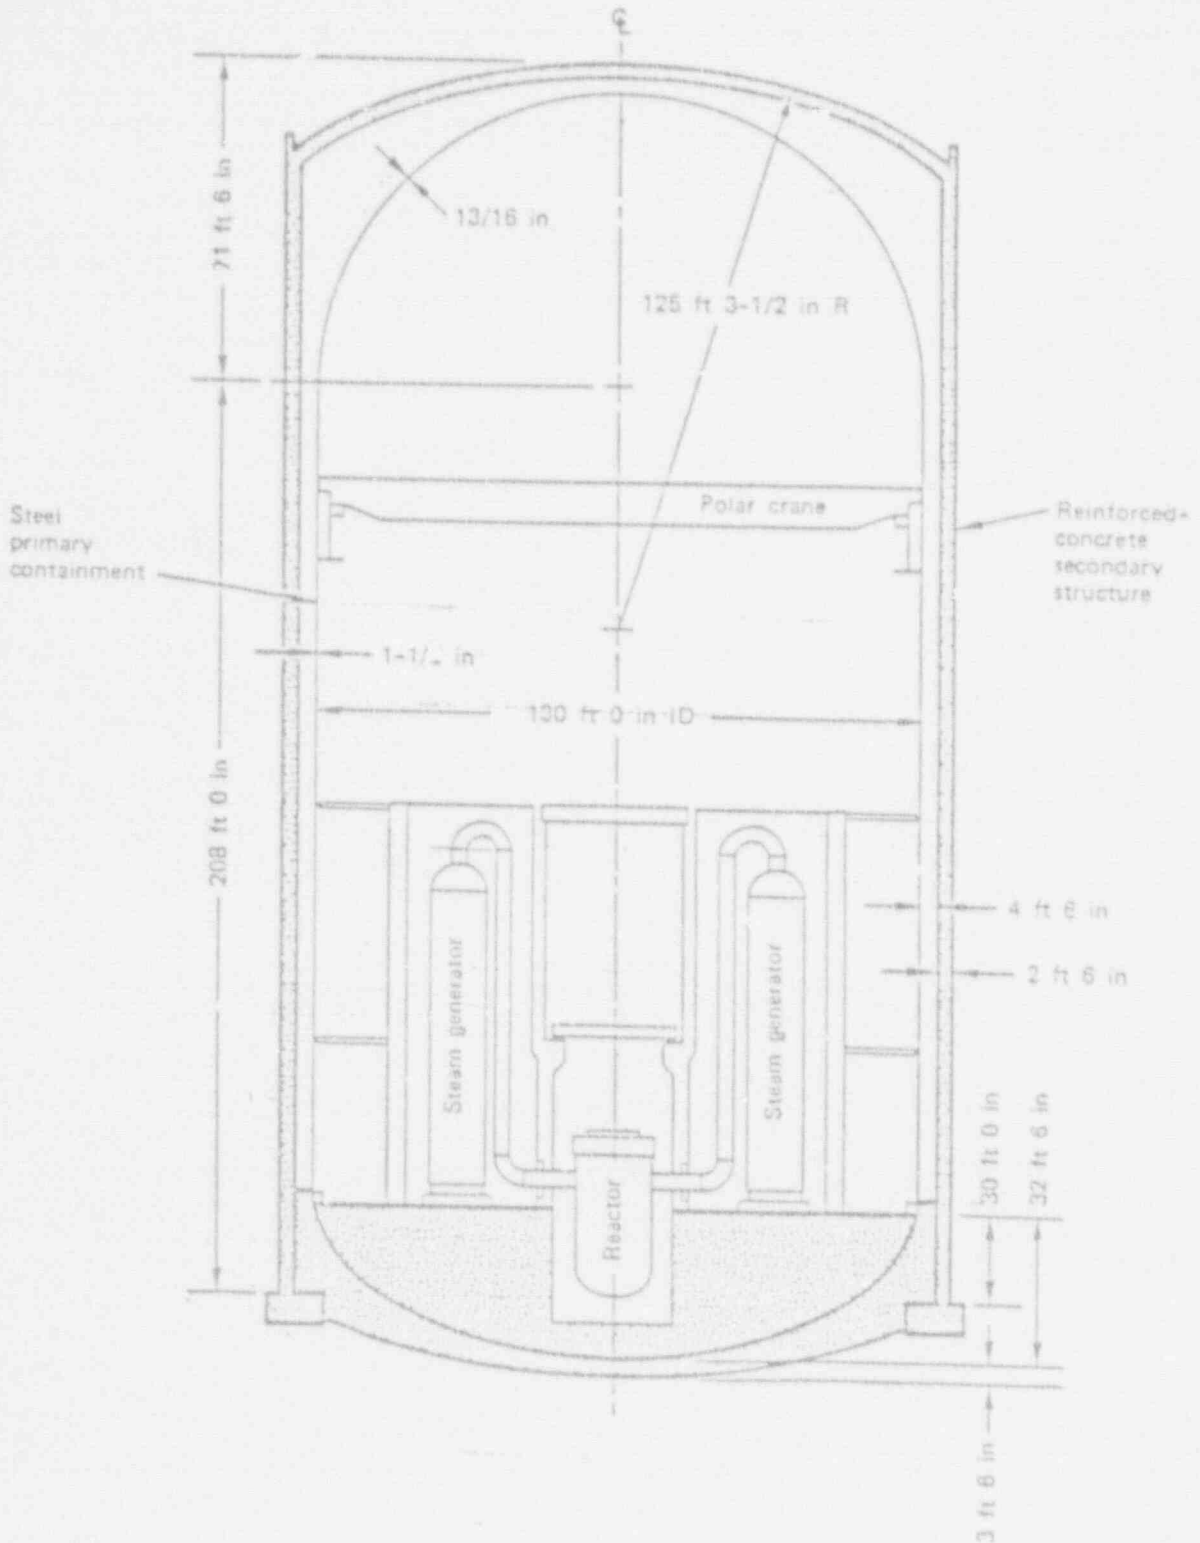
Steel Dry Containment With Reinforced Concrete Secondary Containment (Davis Besse 1)
